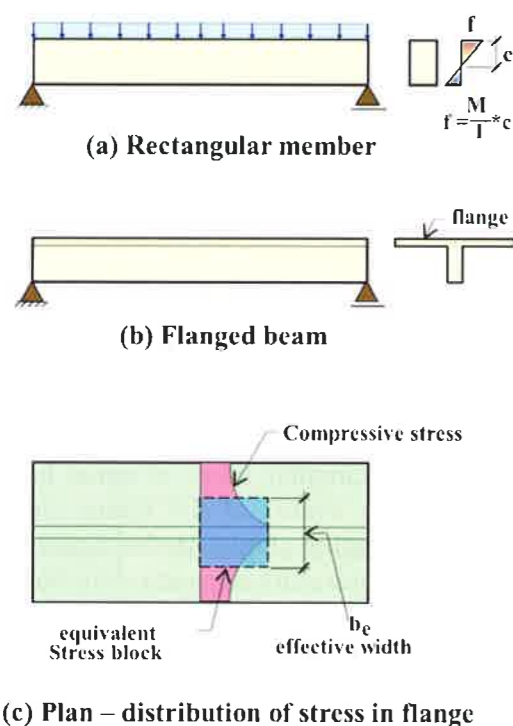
Illustration of Effective Width for a Simply Supported Flanged Beam under Uniform Loading (P539)
